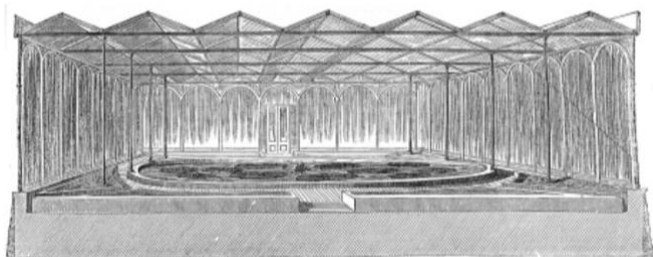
Paxton's design for the water lily house, incorporating ridge-and-furrow roof with hollow columns for
